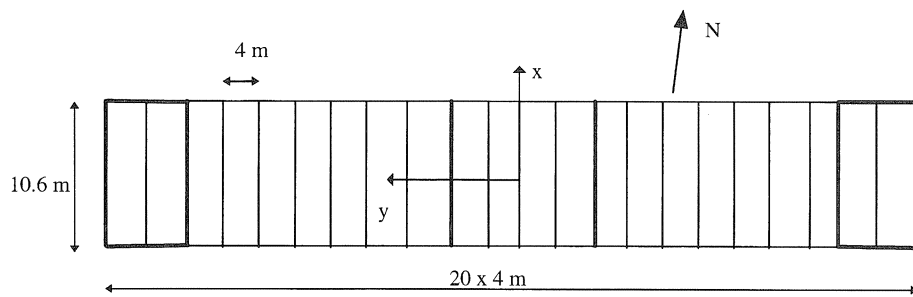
Plan of the building with main structural elements: thin lines are frames, thick lines are braced frames.
